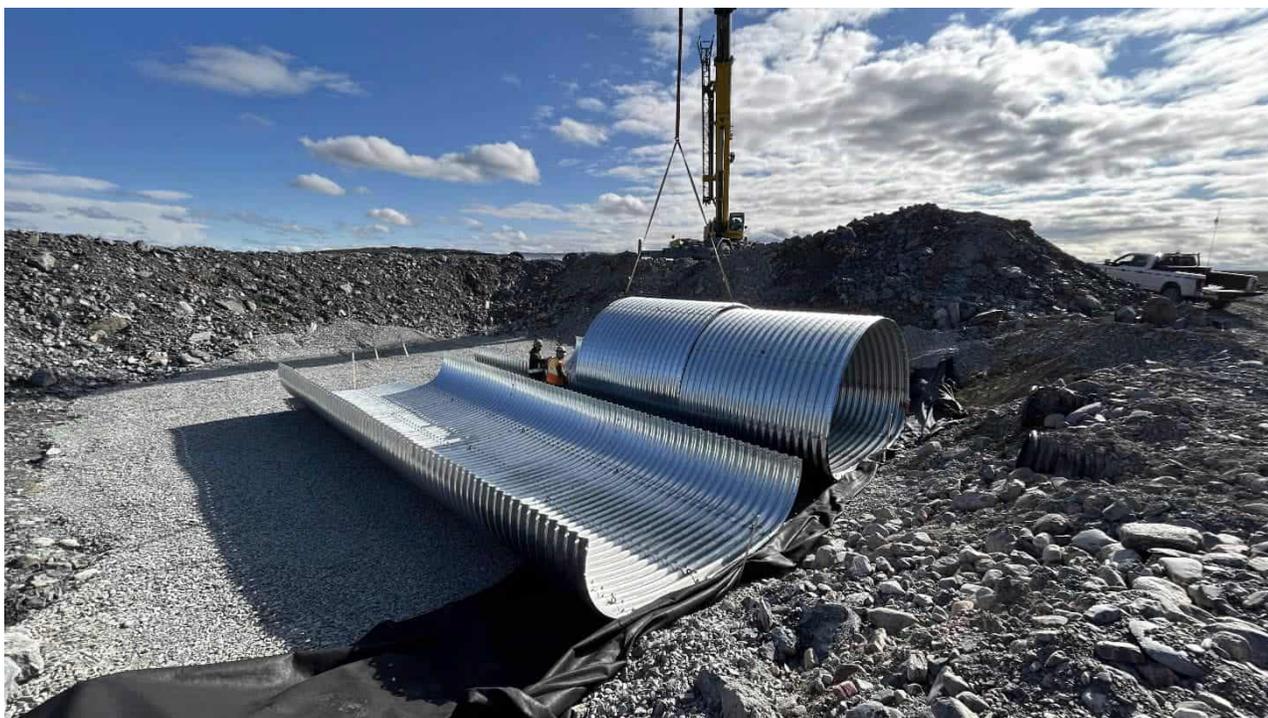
Main Channel Excavation Extents and Bedding Layer Looking Upstream. Taken August 5, 2023
